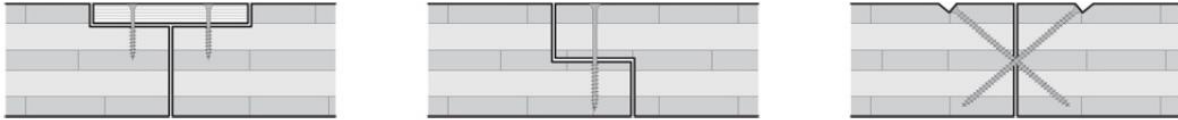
Joining possibilities along the unloaded longitudinal side, left to right: cover strip, half-lapped joint, crossed screws
